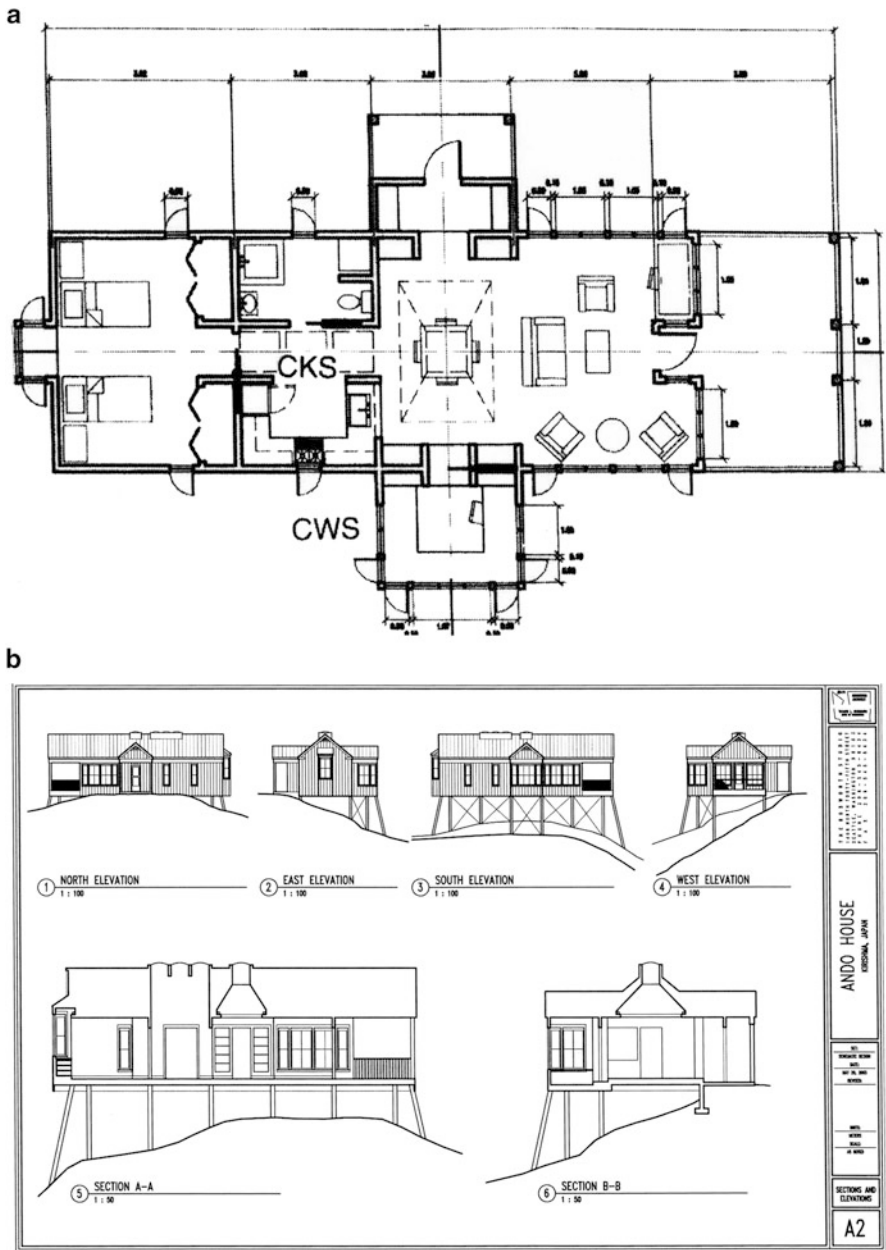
(a) The floor plan of the hillside house including the CWS. (b) Elevations and sections of the house (Bosworth and Ando 2006)
